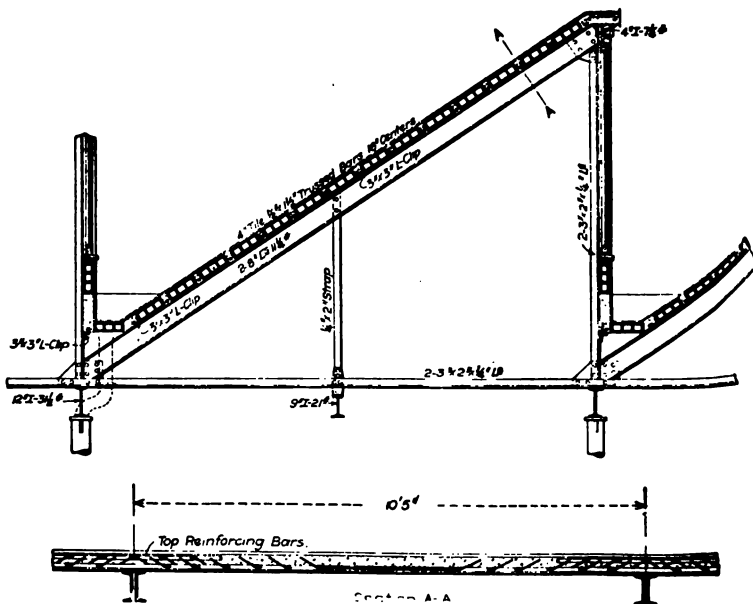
Saw-Tooth Roof of Tile and Concrete Construction.
